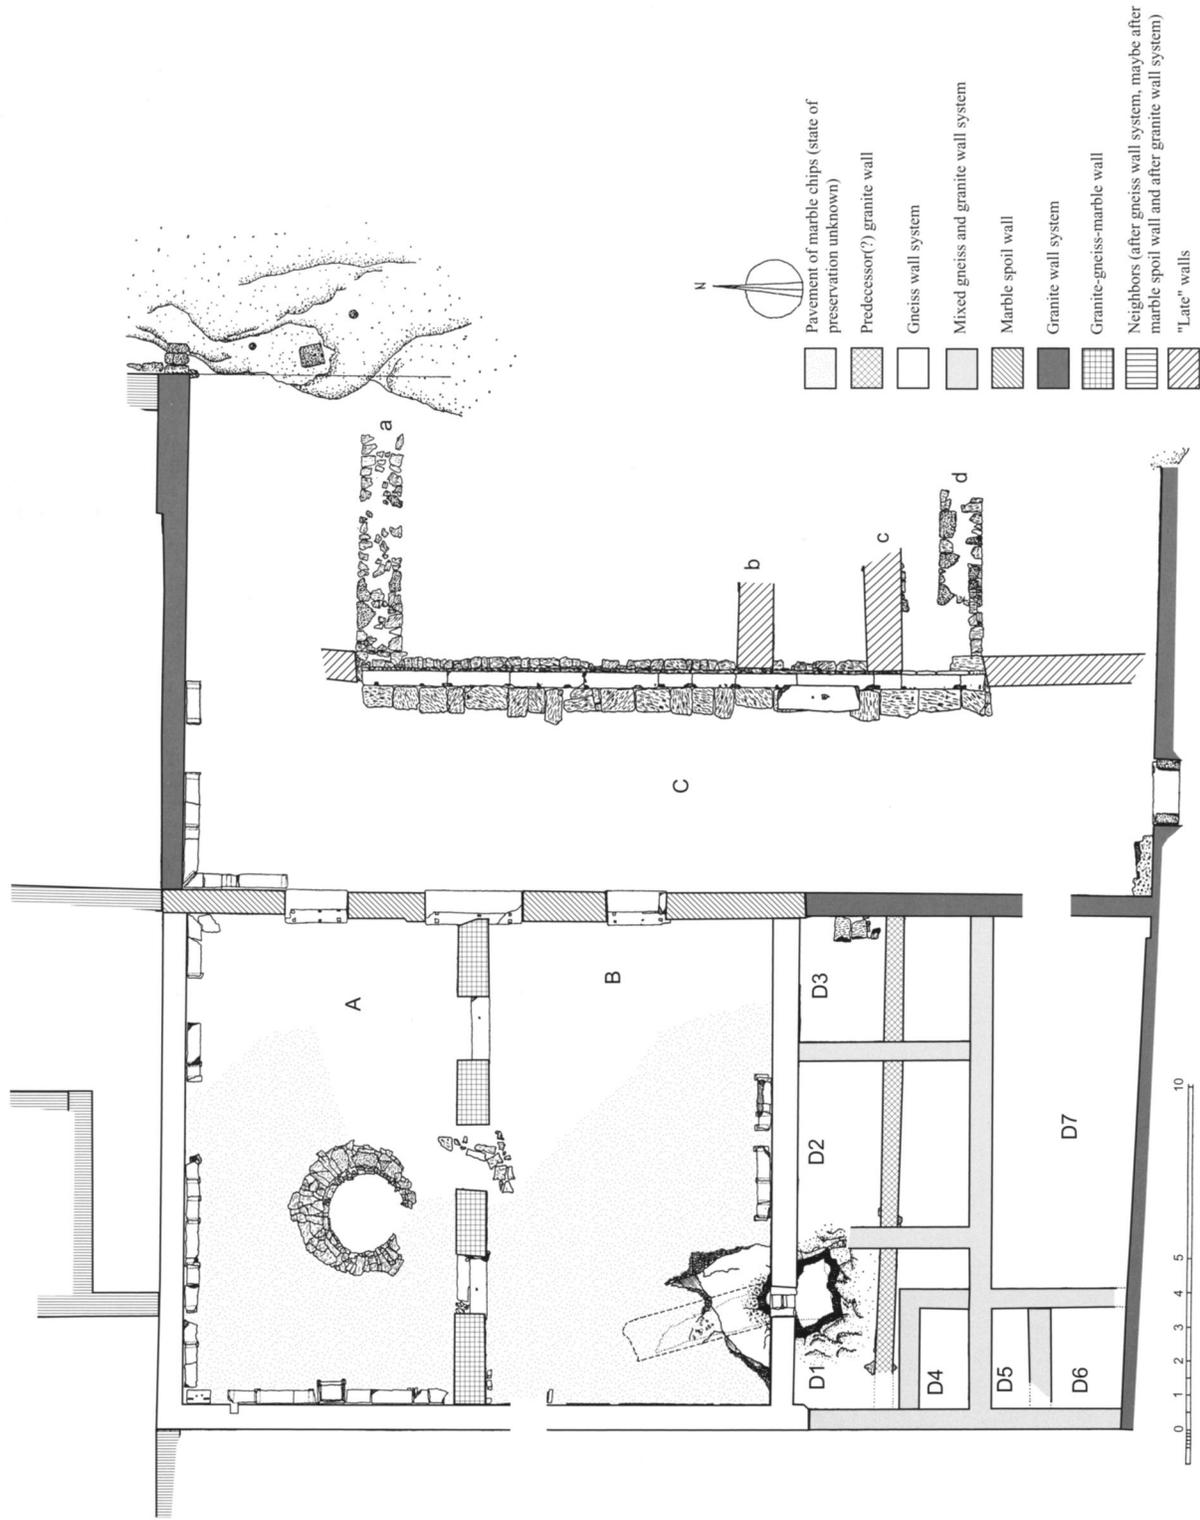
GD 80, plan showing different wall systems. After Bruneau 1970, pl. B
